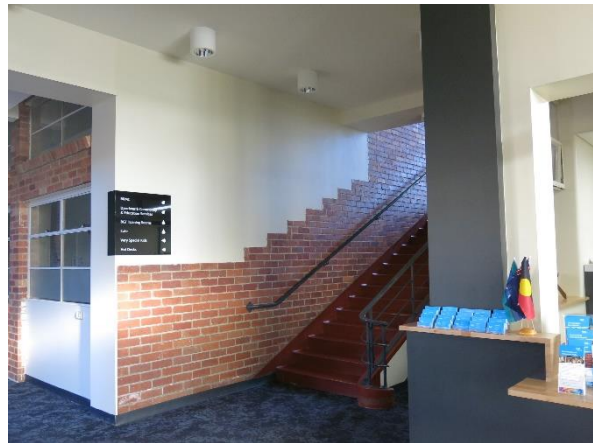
Barkly Street foyer, former Ballarat Girls High School showing original internal brickwork, stairs and balustrade. Note windows to left that have been interrupted by new bulkhead. (May 2020)
